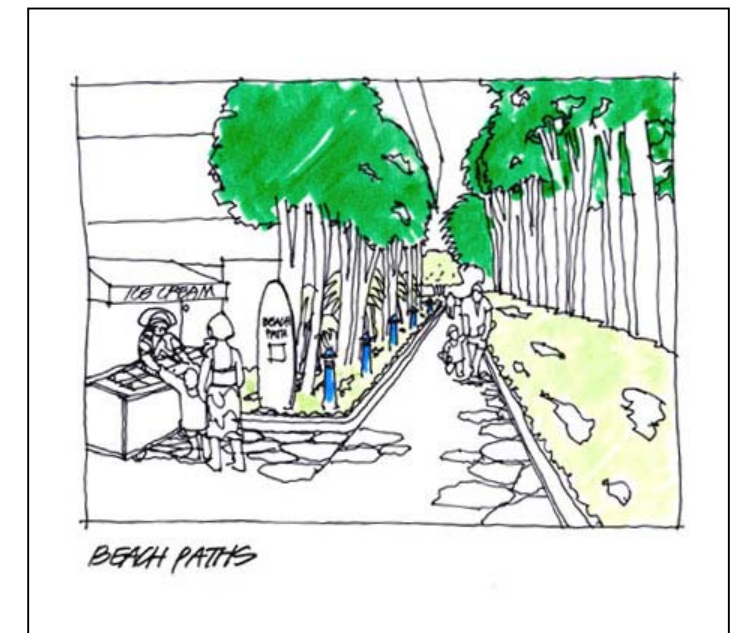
Proposed Landscape, textured paving, and signage added.
